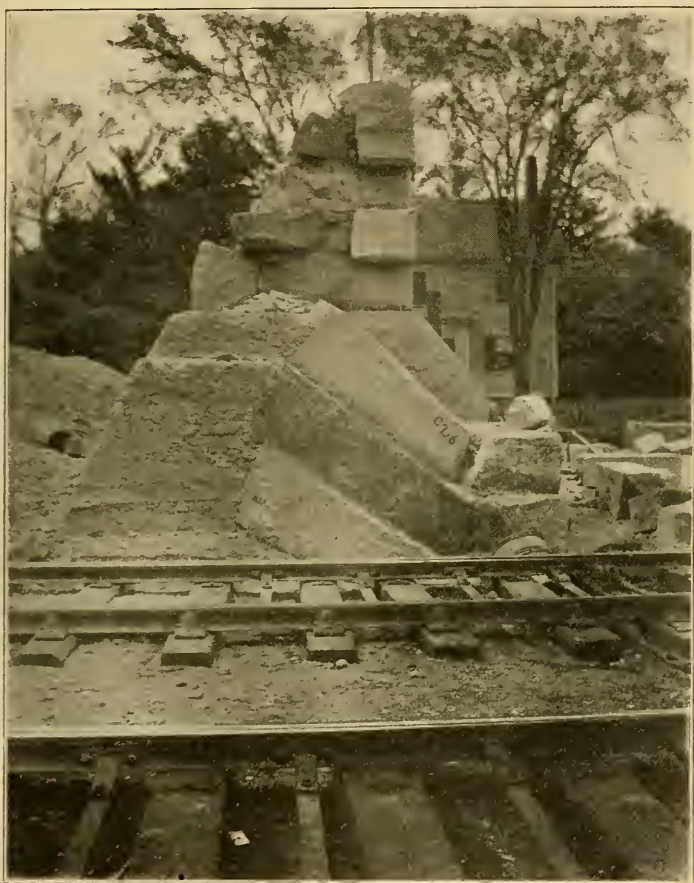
SECTION OF WALK HILL STREET STEEL ARCH ABUTMENT, FOREST HILLS.
